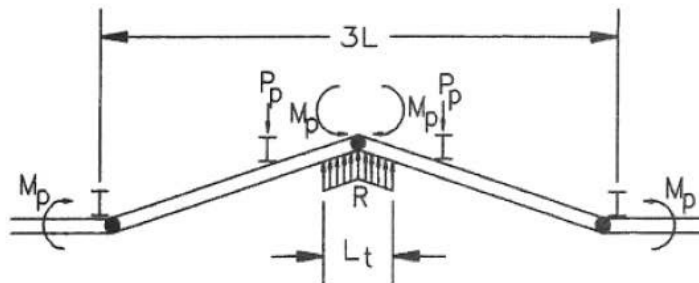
Three-Span Failure Mode for Post-and-Beam Railings
